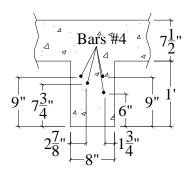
Layout of the Longitudinal Reinforcement in the Girders
